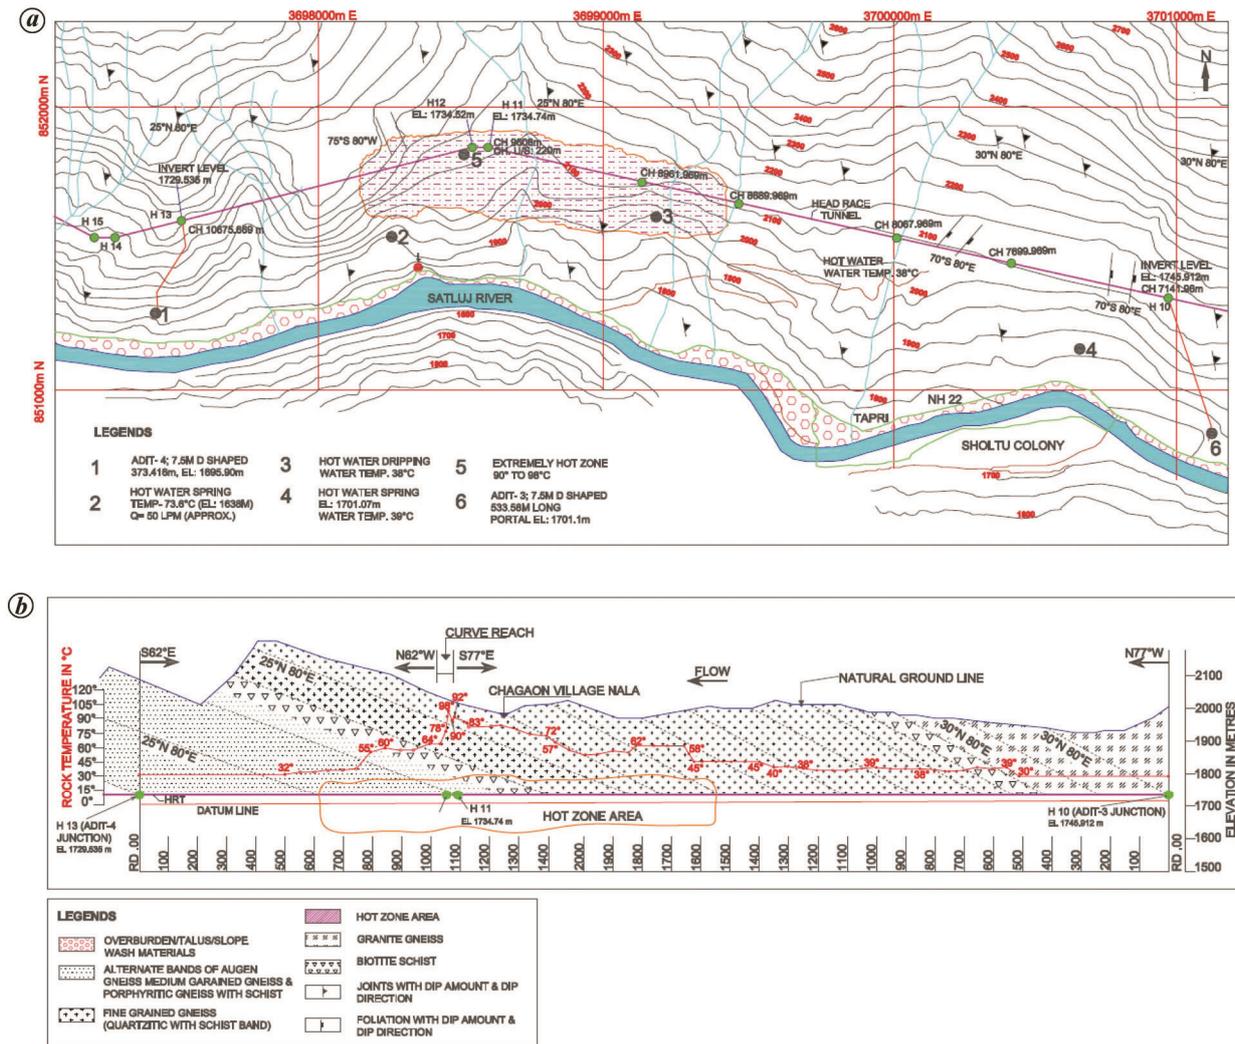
a, Topographical layout of the hot zone and its surrounding area. b, Geological cross-section of head race tunnel.
